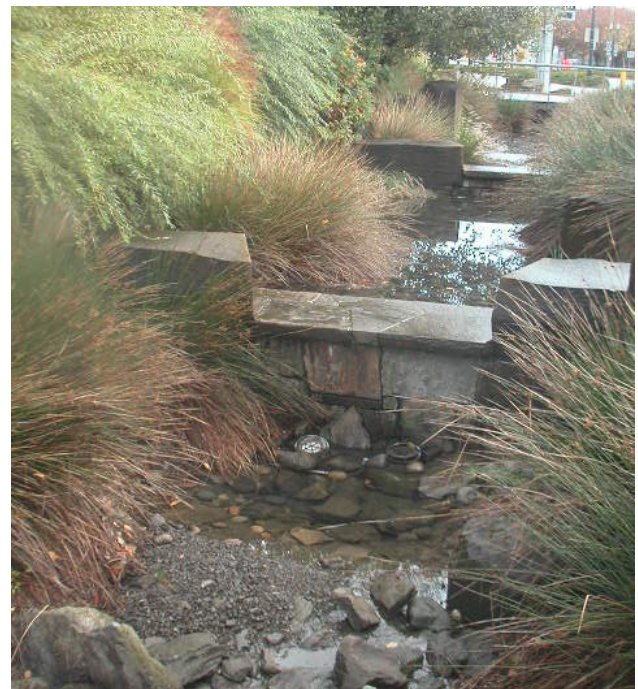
d.2.c. An onsite raingarden and stormwater facility increases site sustainability.
